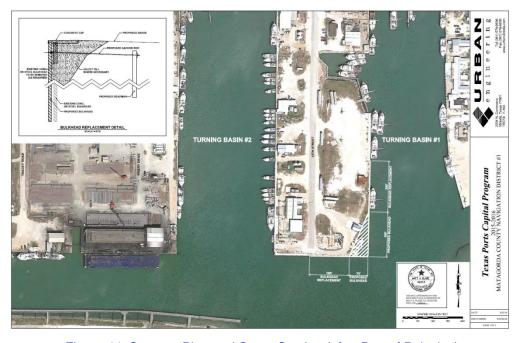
Concept Plan and Cross-Section (after Port of Palacios)
